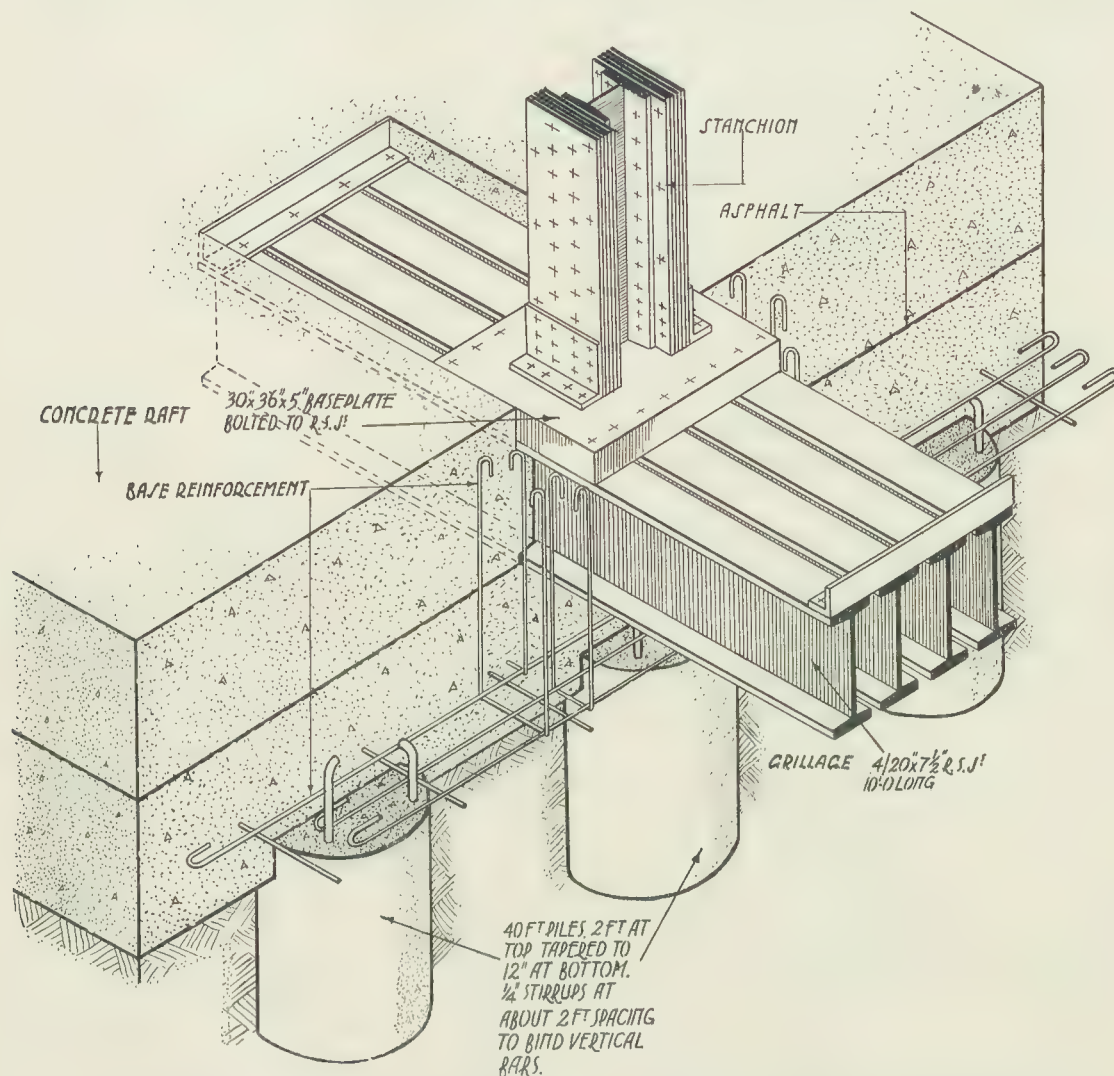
REINFORCED CONCRETE RAFT RESTING UPON A GROUP OF REINFORCED CONCRETE PILES
